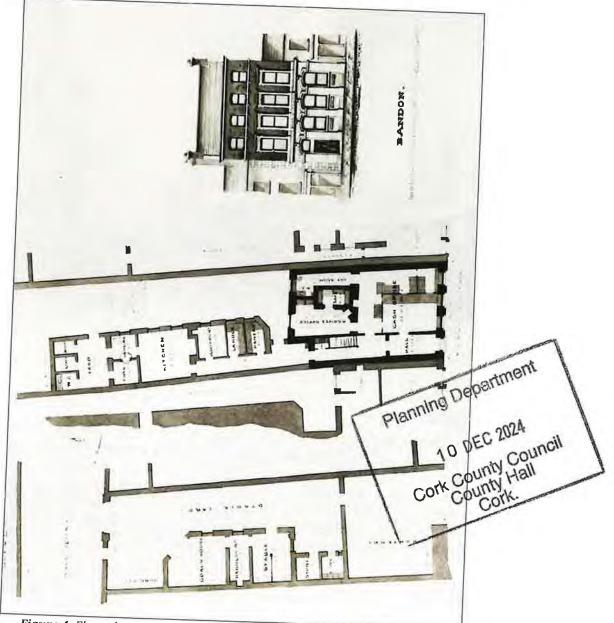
Floor plans and elevation of bank building (Source: Bank of Ireland)
